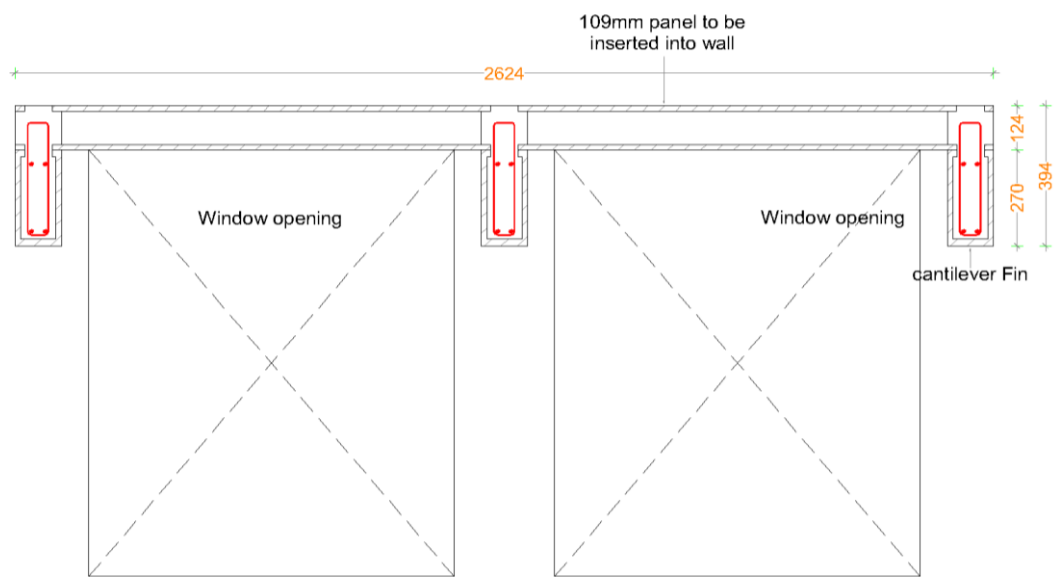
Reinforcement for the fins, to be provided as detailed in type-1
